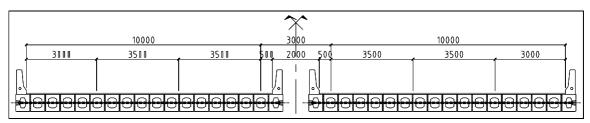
Typical Cross Section of Replacement Bridge
